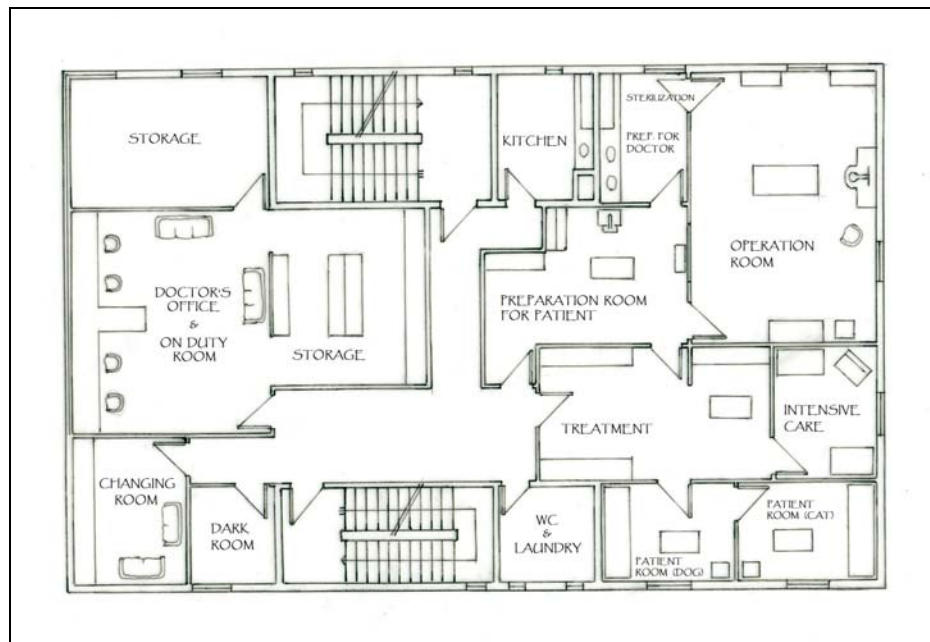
First Floor Plan of Ankara Veterinary Medical Center
